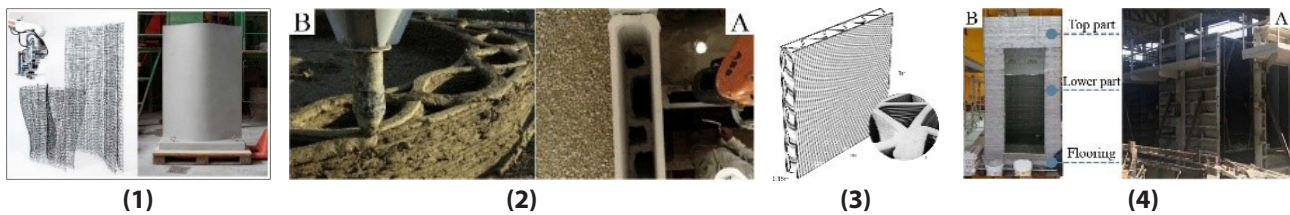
1. 3D printed reinforced wall sample Source: Alim-Khan et al., 2021/ 2. A) Concrete 3D printed wall B) Thatch 3D printed wall. Source: Alhumayani et al., 2020/ 3. Wall system with sinusoidal cross-section Source: Kuzmenko et al., 2020/ 4. A) Prefabricated bathroom with steel formwork B) 3D printed concrete bathroom. Source: Wang et al., 2014.
